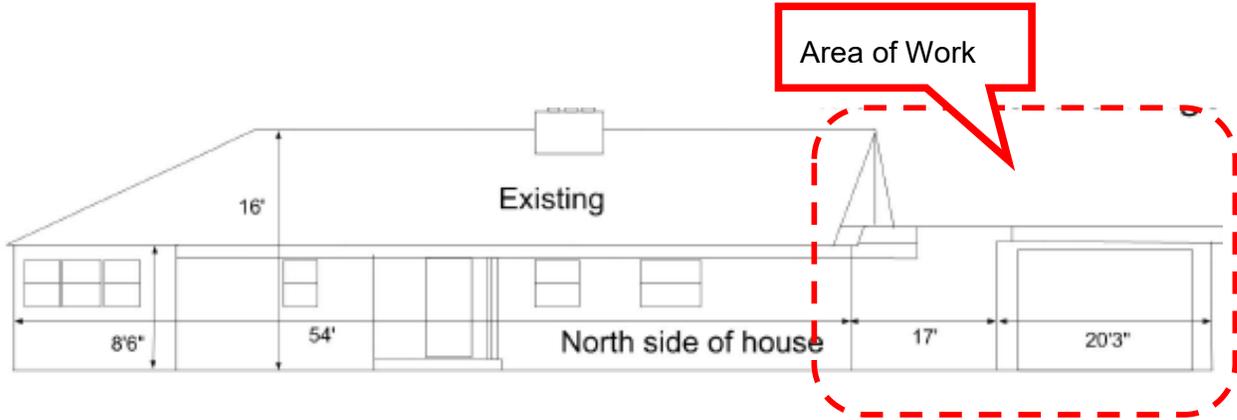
Proposed Street View – North Elevation Enlarged (Not to Scale)
